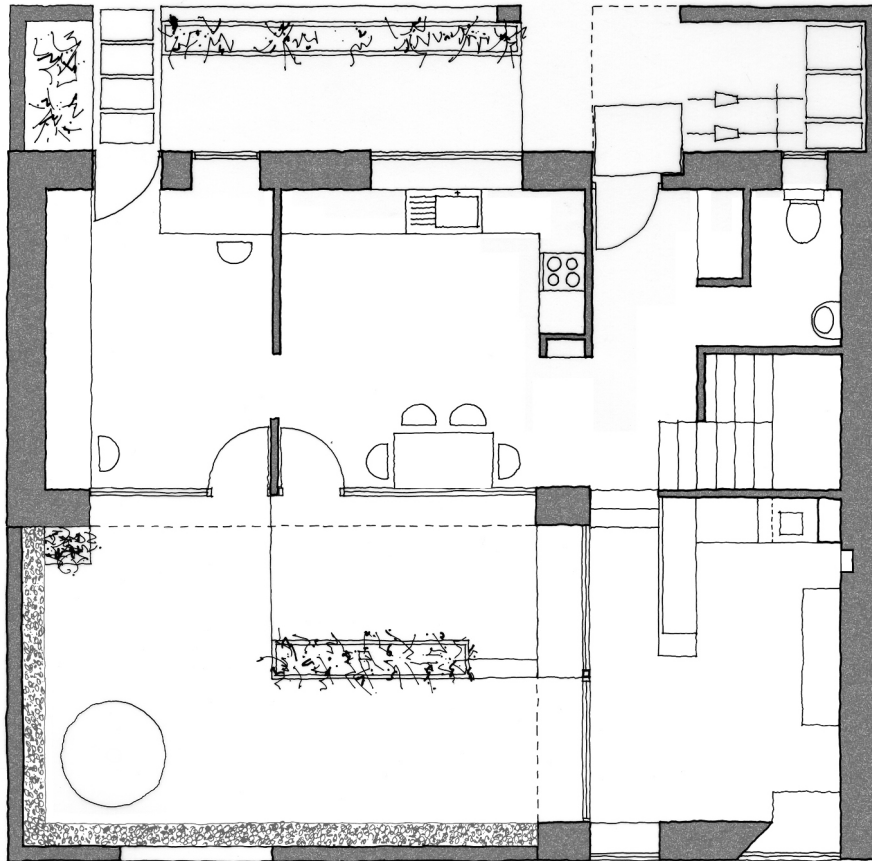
Ground floor plan of 3 bed house type1:100
